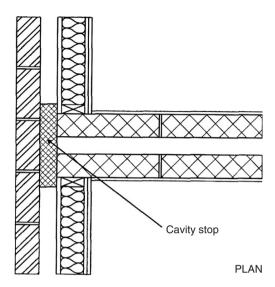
Wall type 2 - external cavity wall with timber frame inner leaf
